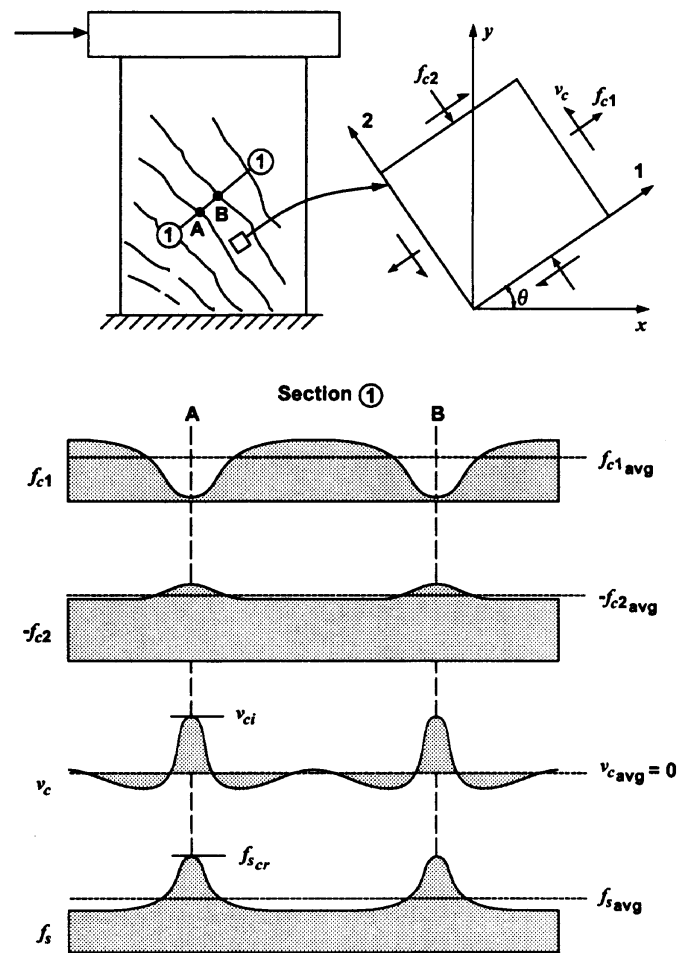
Nature of Disturbed Stress Fields in Cracked Reinforced Concrete
